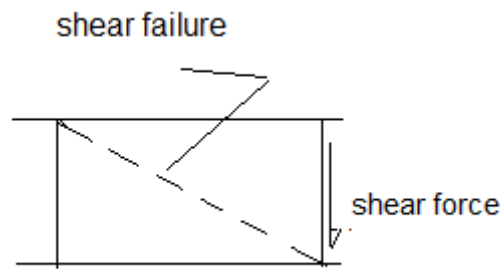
Failure for solid and small web opening ( $d_o=50$  mm) girders
